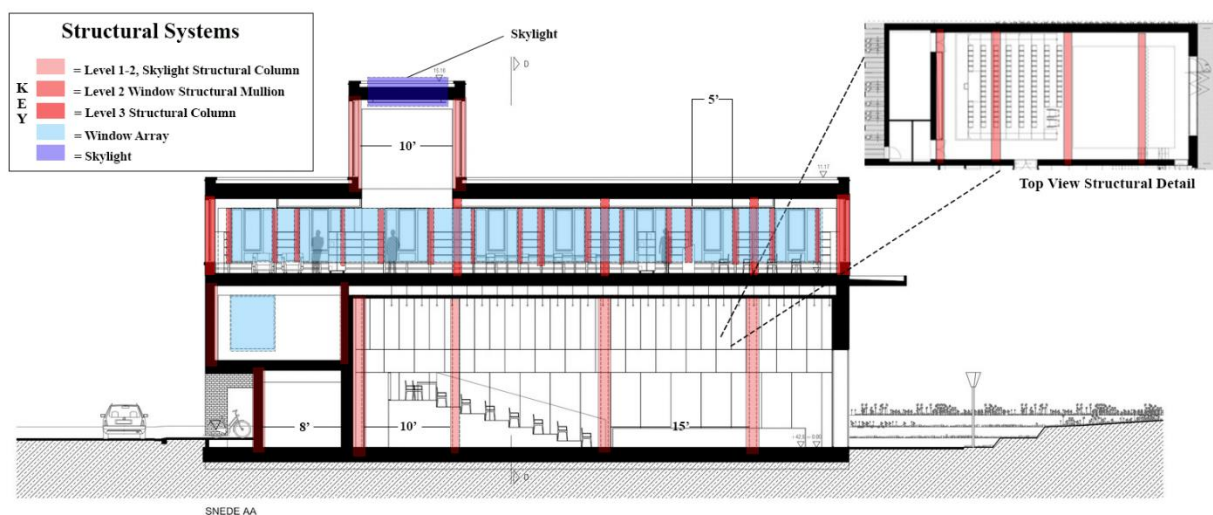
LCC, Structural Bays Diagram, Section AA. Adapted from Archdaily & HUB
